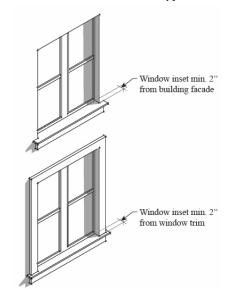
Windows inset from the building facade add to the richness of the building facade.
